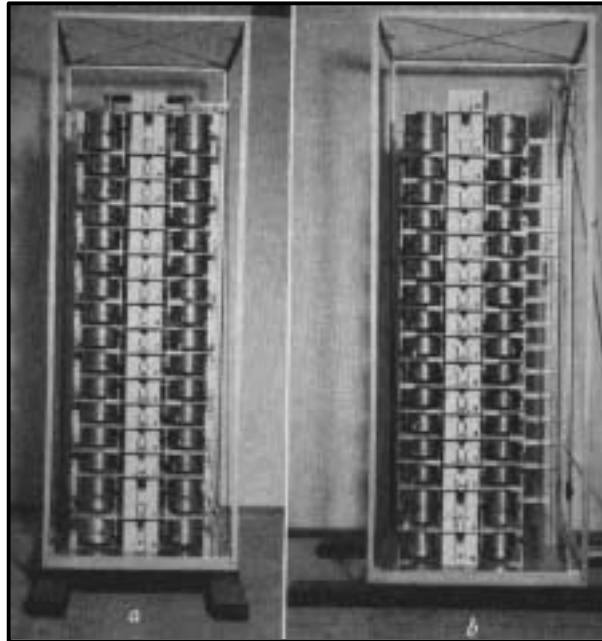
Testing Apparatus for Modeling 16-Story Infilled Frame Building
